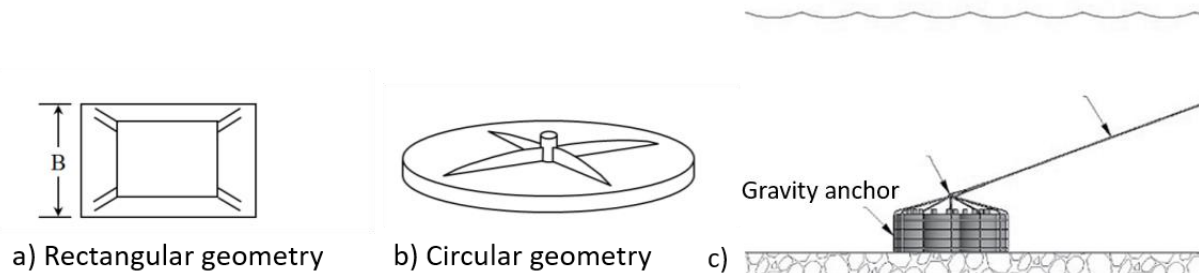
A) AND B) SHALLOW FOUNDATIONS [13], C) GRAVITY ANCHOR [14]
